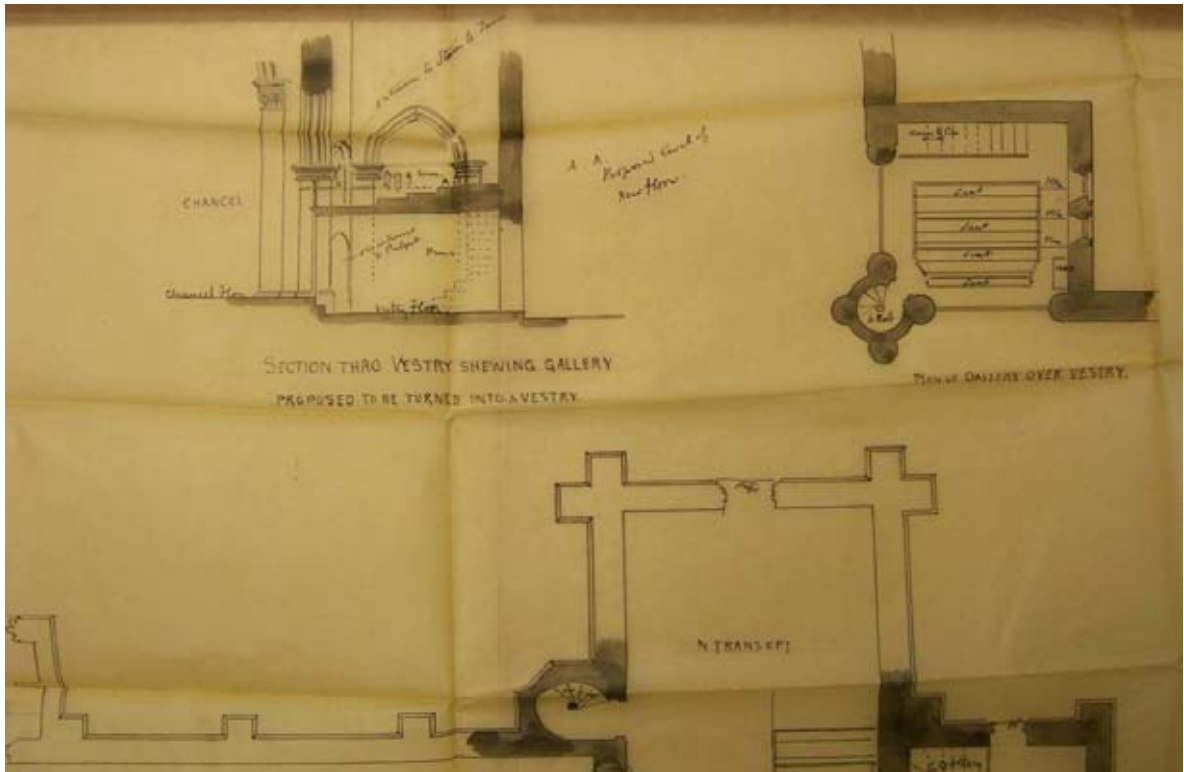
A section and plan of the gallery over the original vestry, 1883 (Guildhall Library).
